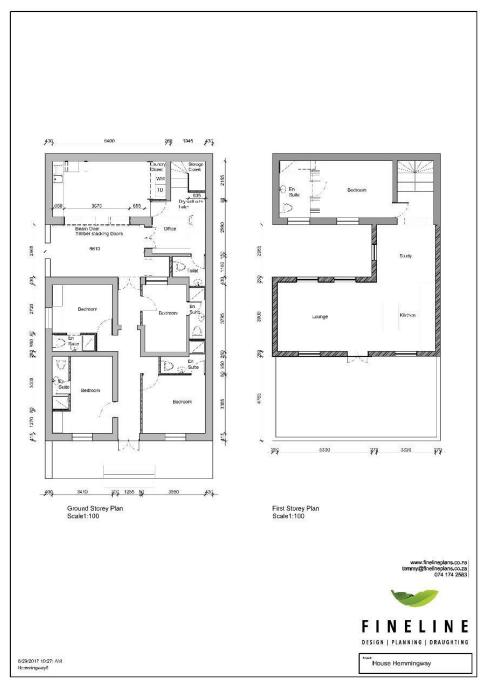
ARCHITECTURAL DESIGN PROPOSALS
